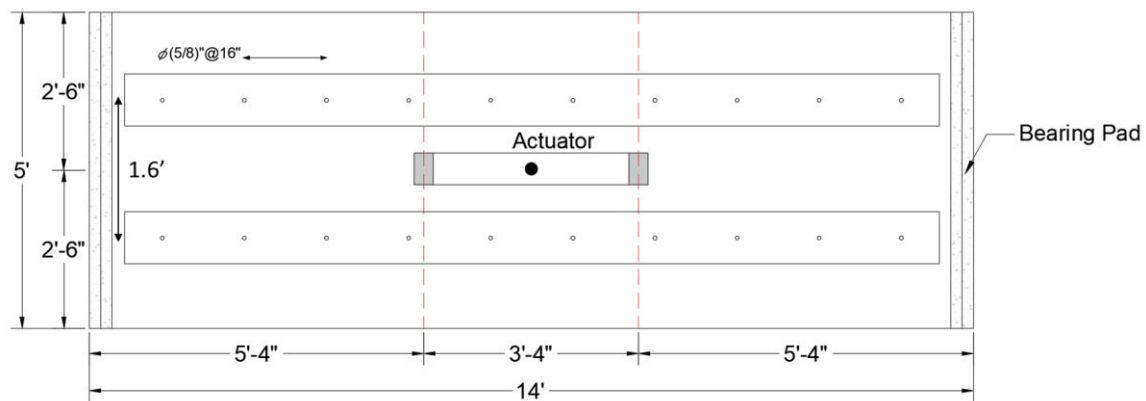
Plan view of the strengthened C-channel slab test setup.
